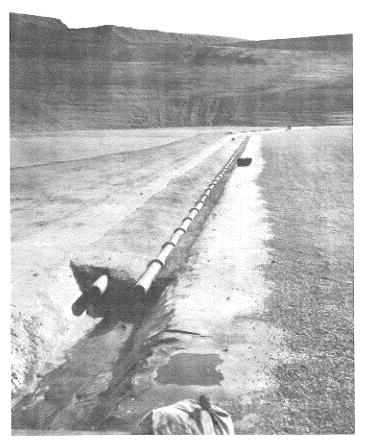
Installation of 4-inch tile drains. Note one line completely encased in concrete and other with open joints on top.
